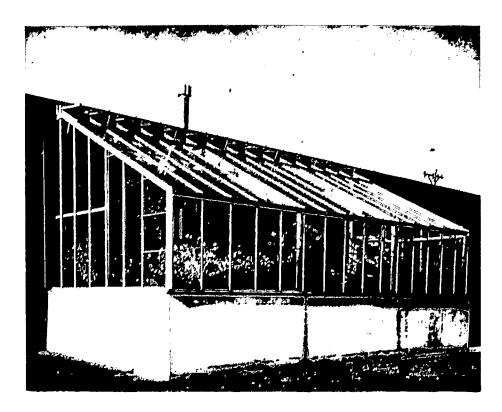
Greenhouse connects with classroom. Note ventilation facilities. Wichita High Southeast, Kan.
